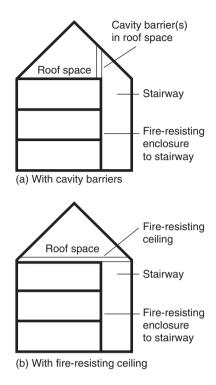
Alternative cavity barrier arrangements in roof space over protected stairway in a house with a floor more than 4.5 m above ground.
